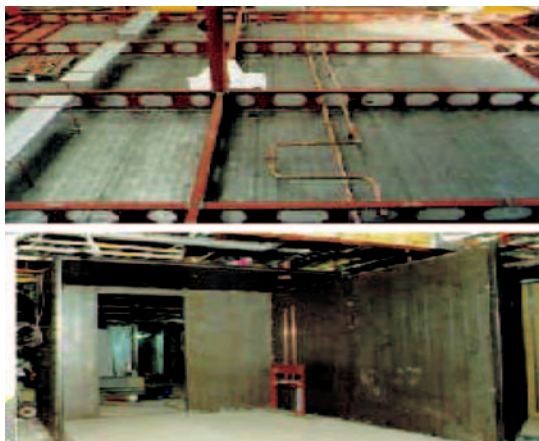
Deck and wall sections made from laser-welded panels [9].
